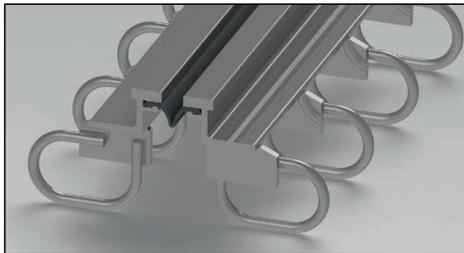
Single gap joint with standard loop anchorage in normal concrete
